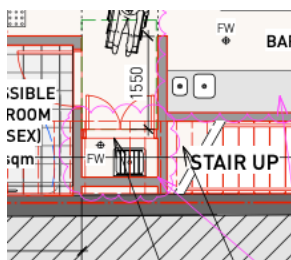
, Ground Floor: Cleaner's cabinet added below stairs
